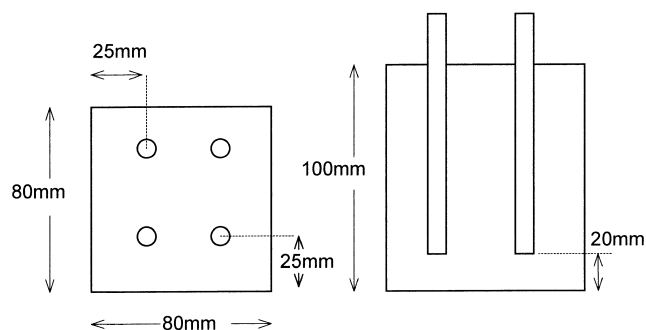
Specimen's shape and dimensions (corrosion tests).
